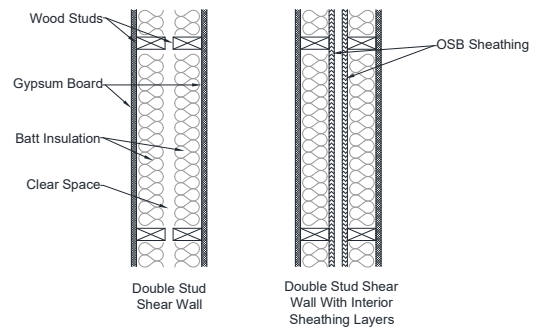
Typical double stud demising wall (left) and double stud demising wall with added OSB sheathing (right)
